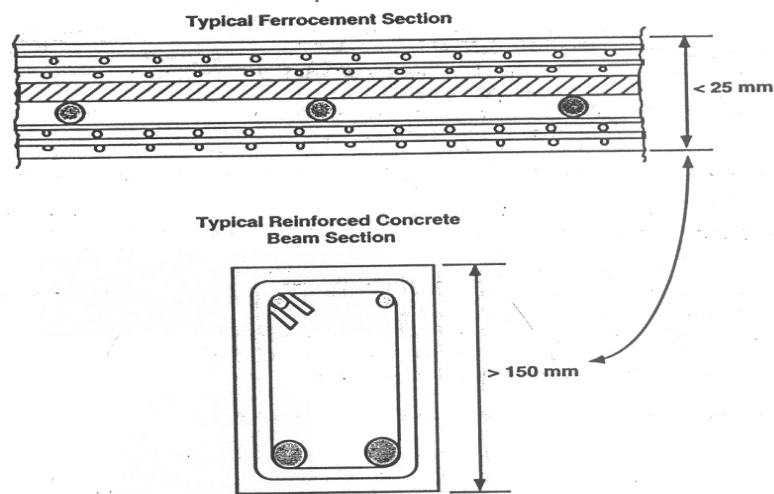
Typical cross section of ferrocement versus reinforced concrete (Naaman, 2000)
